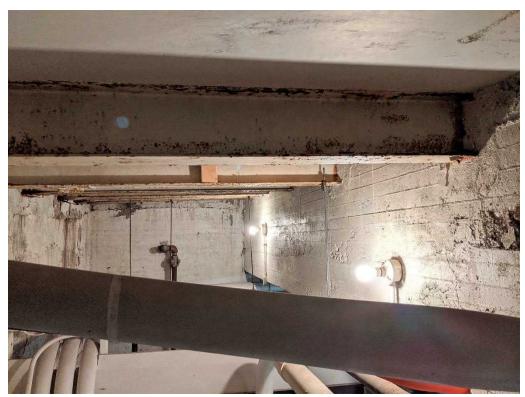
Looking East Along Length of Vault. Concrete Beam on Right.
